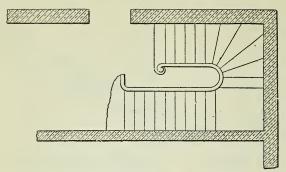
Plan of Geometrical Stair with Quarter Space.
